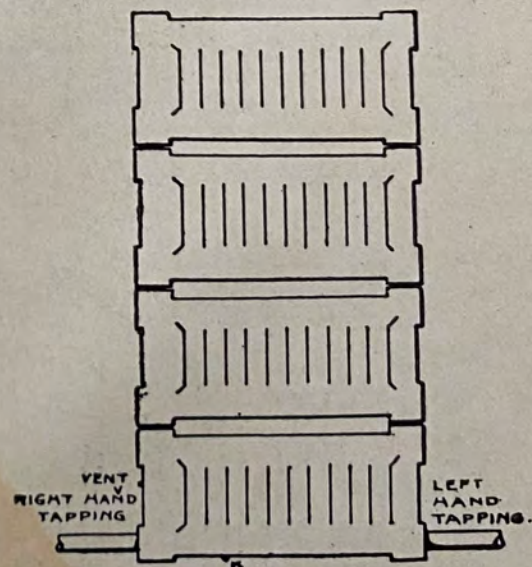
Assembled Four Horizontal Sections in Four Tiers One and Two-pipe Steam
